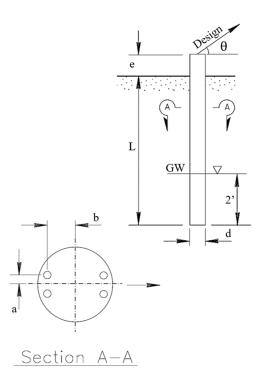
Laterally Loaded Reinforced Concrete Pile
